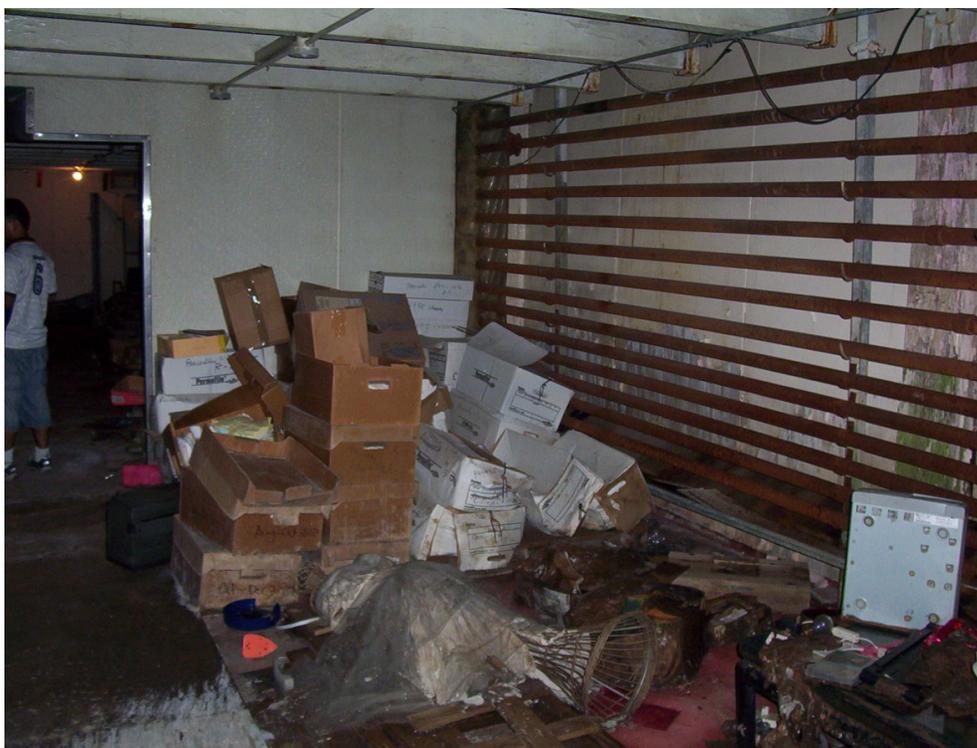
Cold Storage room on the second floor of 42-46 10<sup>th</sup> Avenue.
